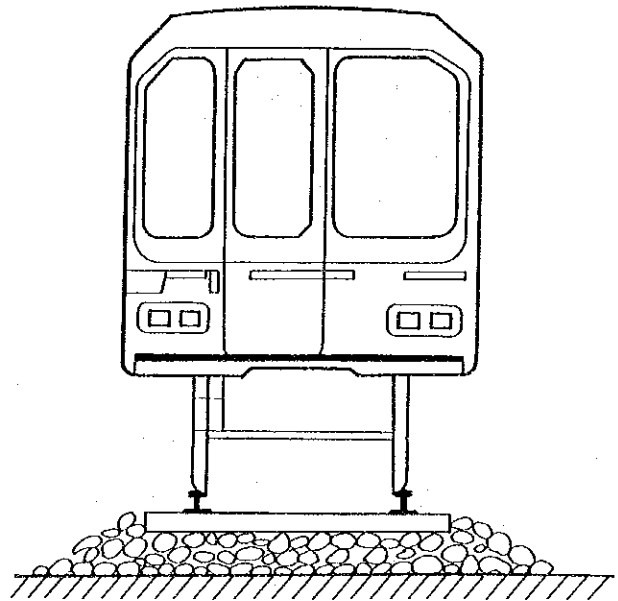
Cross Sectional Outline of Steel-wheel Railway
